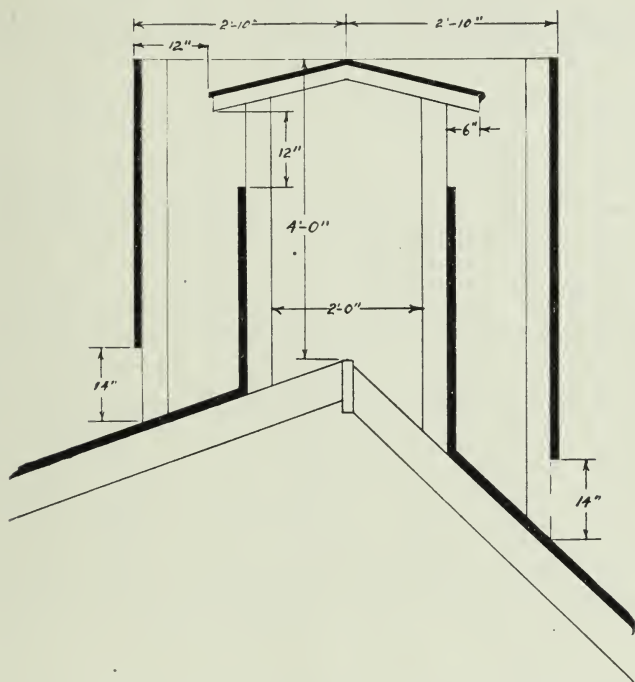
Fig. IV. Details of construction of double-walled ventilator. Warm air escapes from the shaft through the continuous opening 12 inches in width at the top of the inner wall; the opening at the bottom of the outer wall permits cold air to enter and pass up between the walls, assisting the draft, while the upper portion of the outer wall keeps snow or rain from blowing into the shaft.
